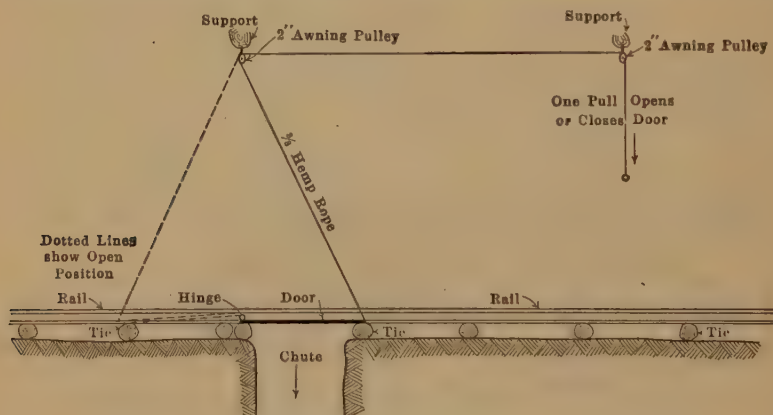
SCHEME FOR OPENING CHUTE DOOR.
